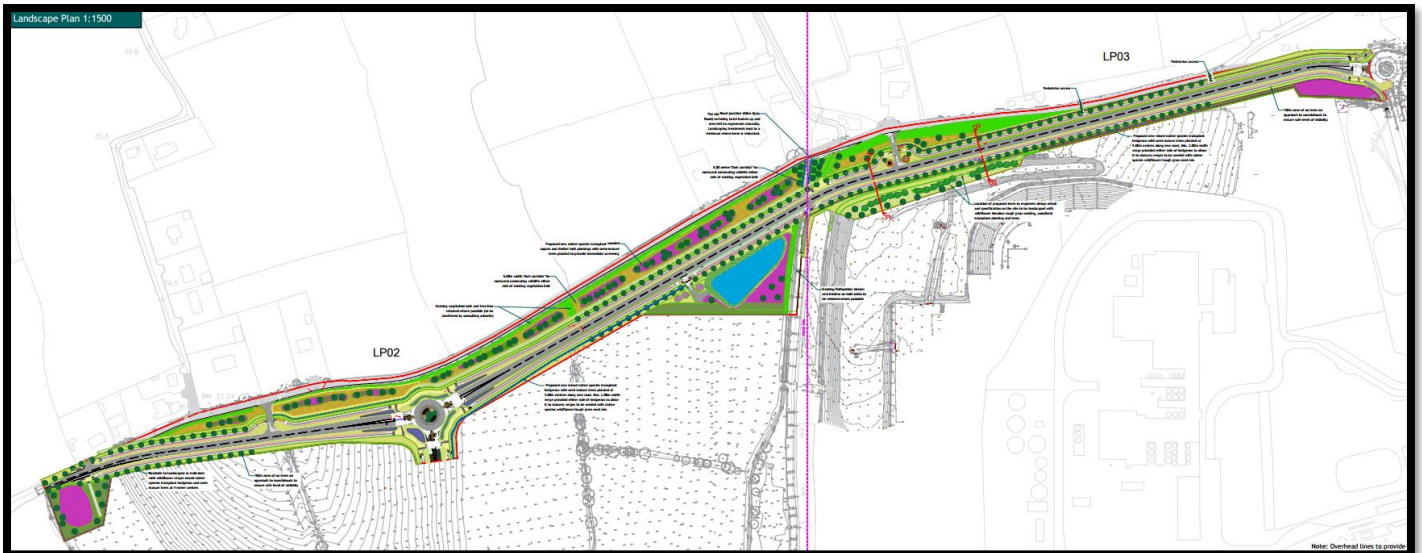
Landscaping Plan prepared by Austen Landscape Architects
